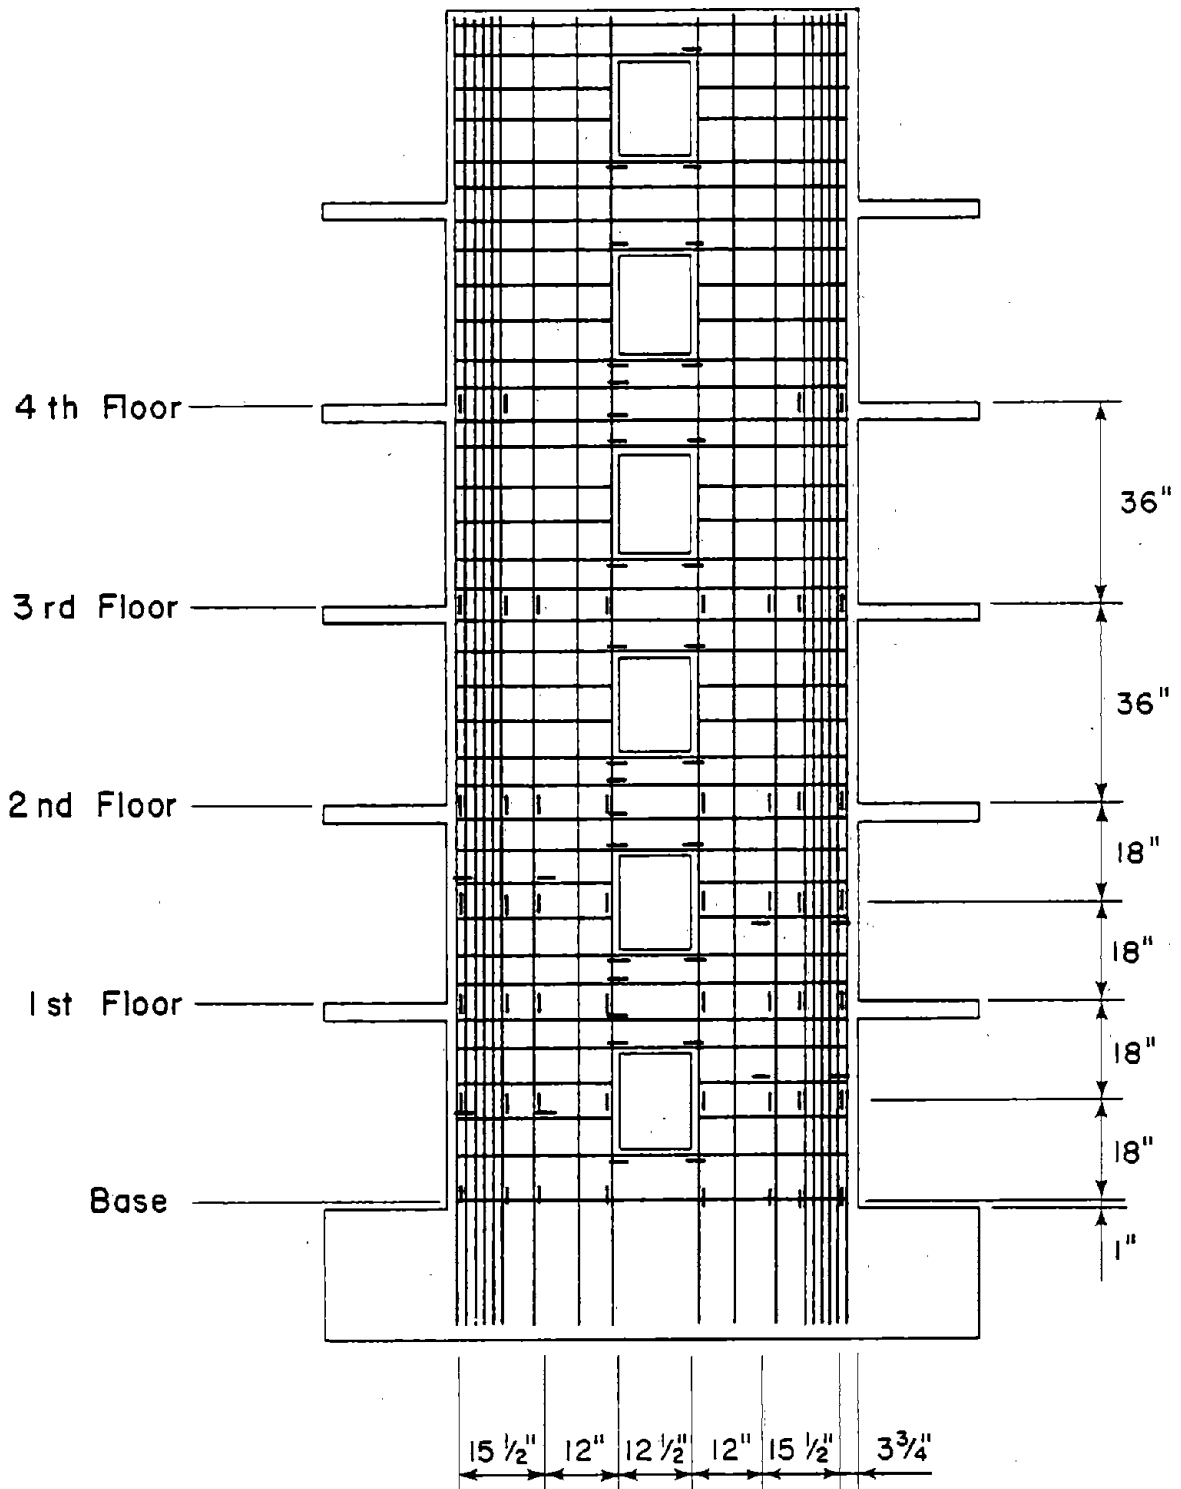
Strain Gage Locations on Vertical and Horizontal Reinforcement for Specimen PW-1
